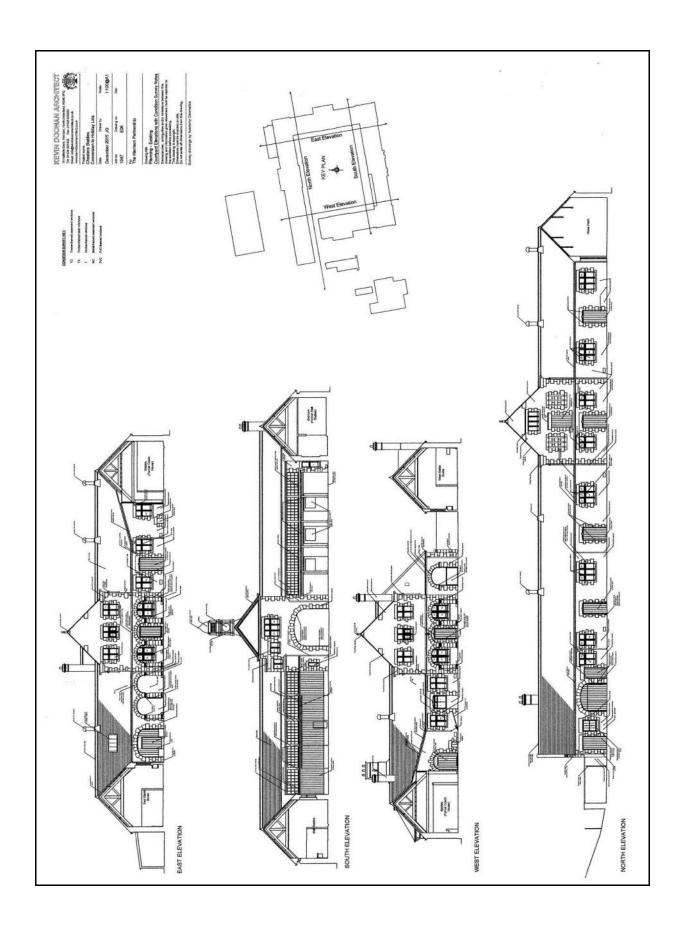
Chesters Stables. Internal elevations (Doonan Architects Drawing E06).
